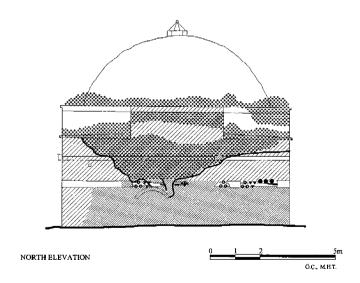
Visualisation of structural failures and material deterioration of the north wall.
